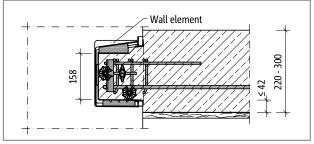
Schöck Tronsole® type Z: Wall element as stay-in-place formwork; underside of the landing lower than the connection frame of the wall element
